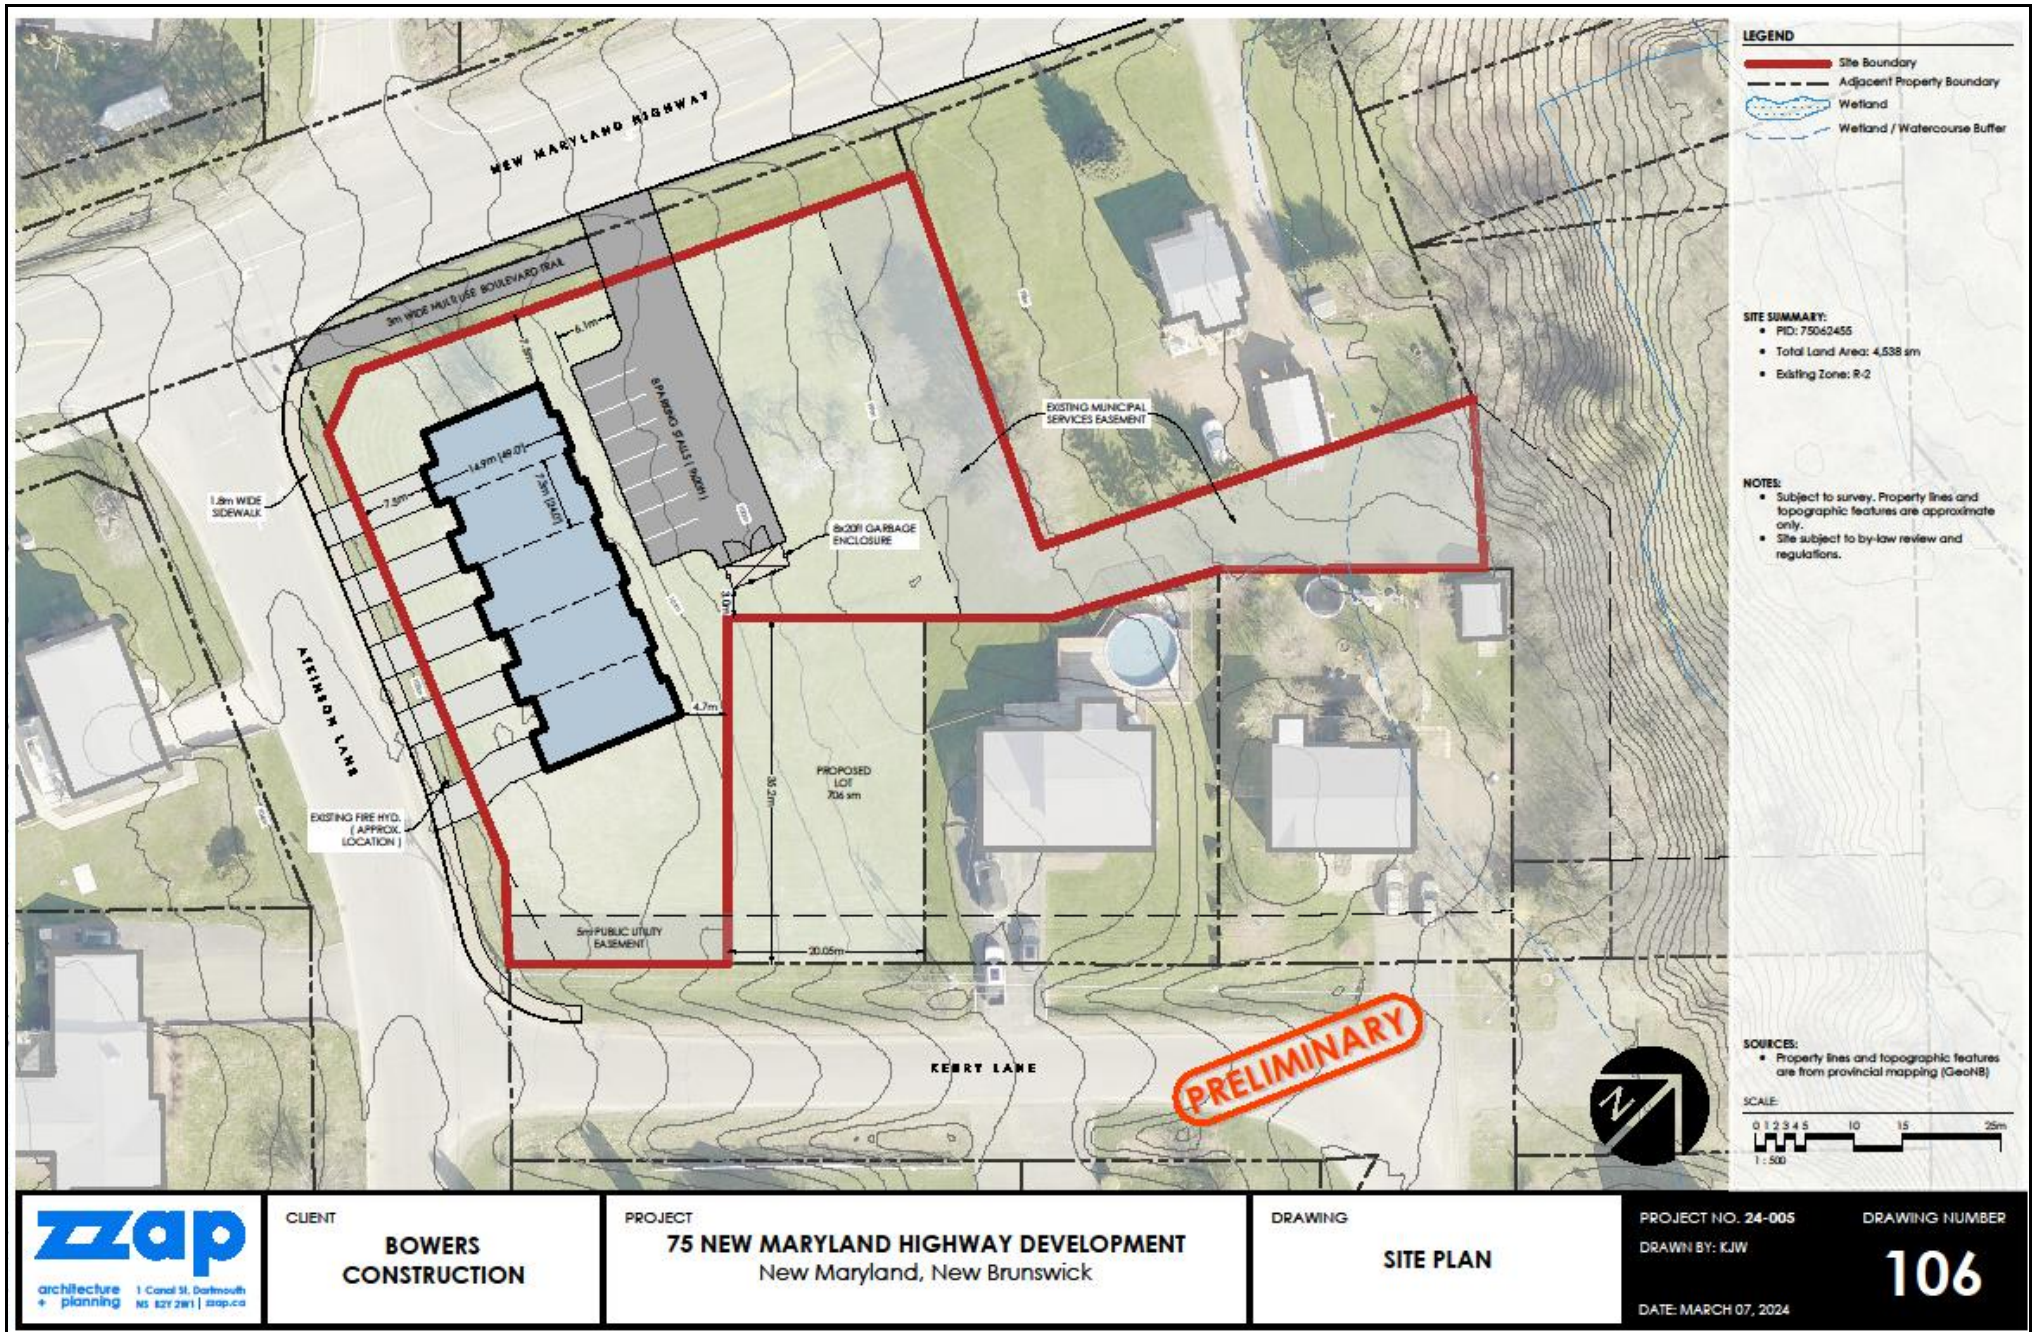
Preliminary Site Plan Concept Drawing – Zzap Consulting Inc. – 07 March 2024
